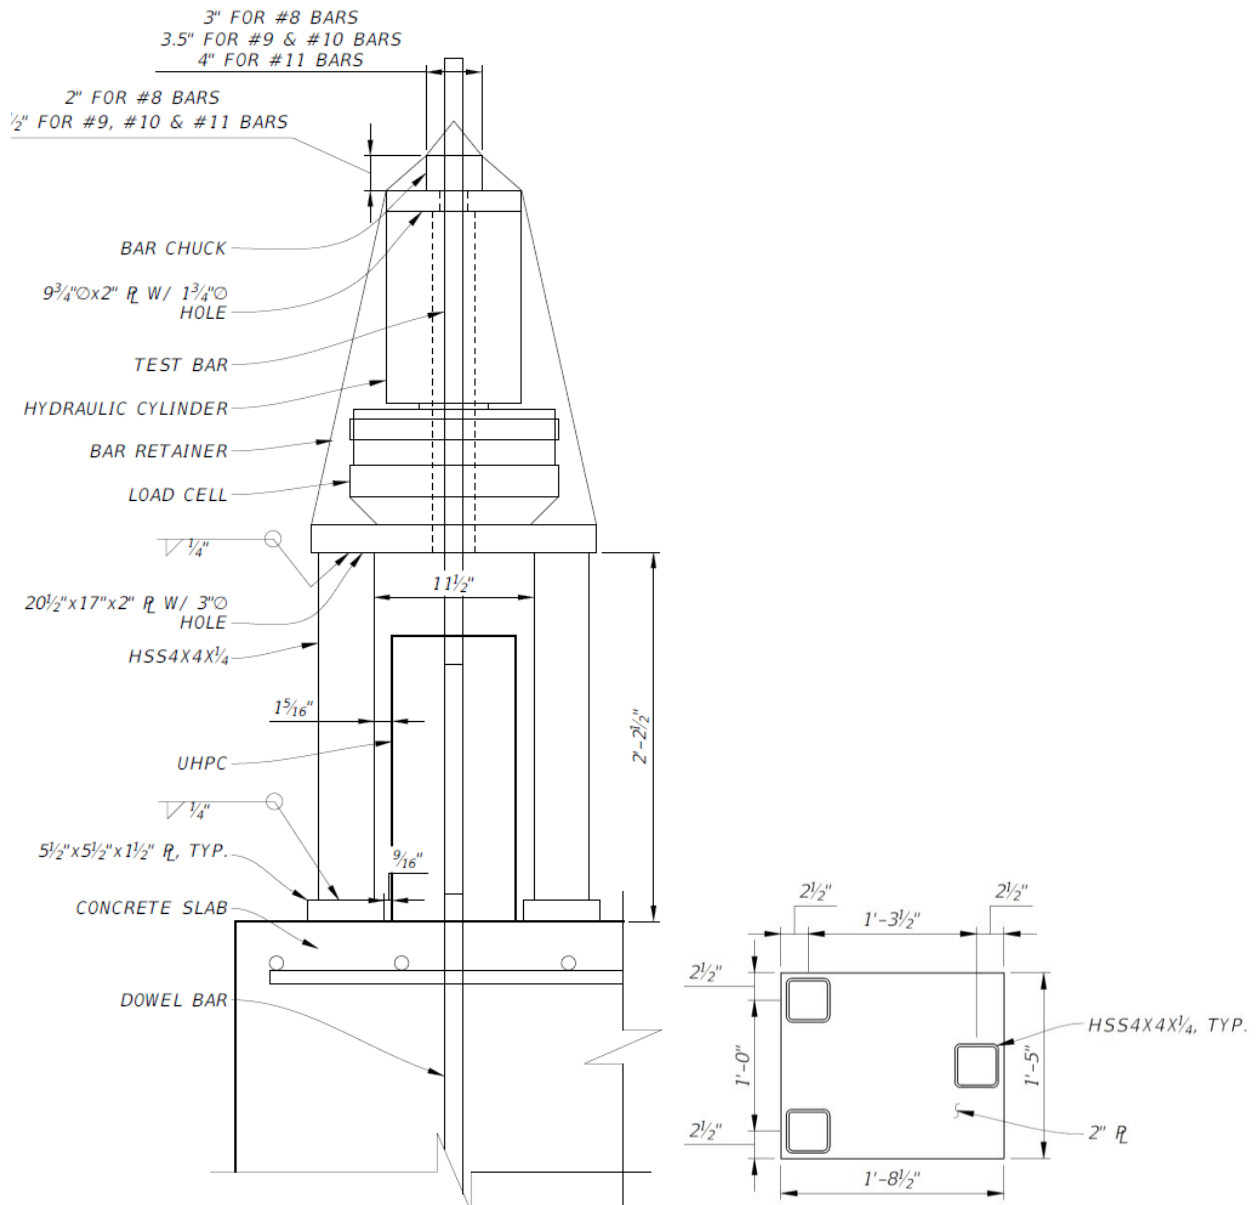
Testing equipment construction drawing with end view of UHPC strip
